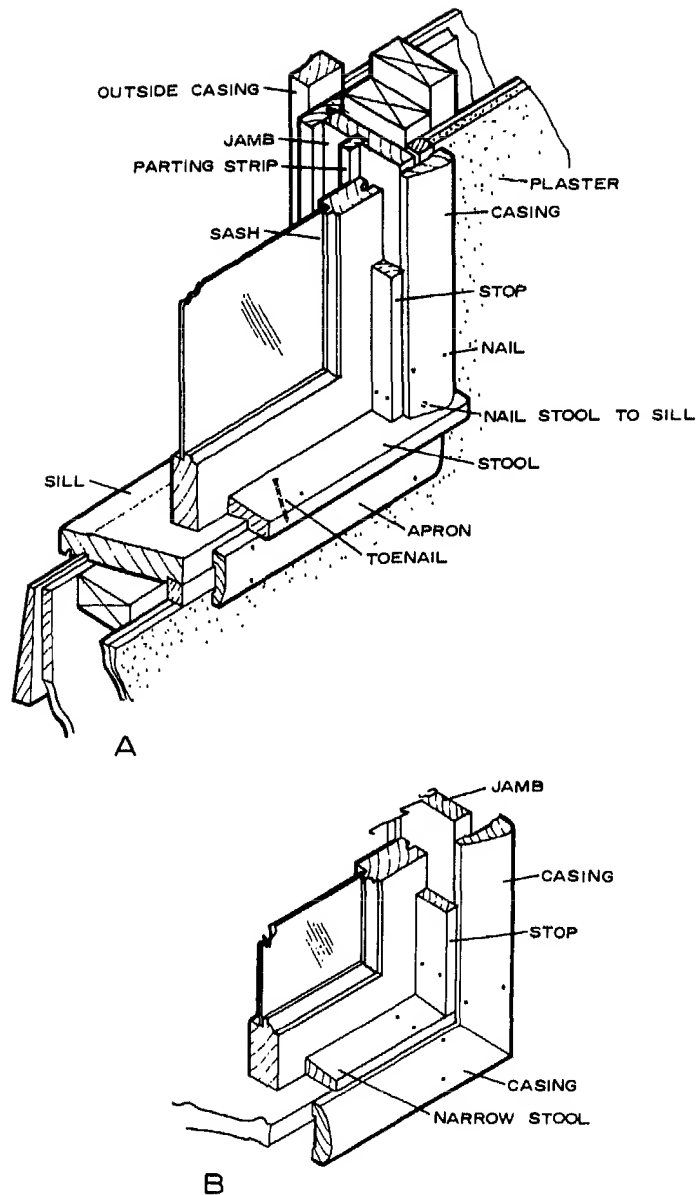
Installation of window trim: A, with stool and apron; B, enclosed with casing.
